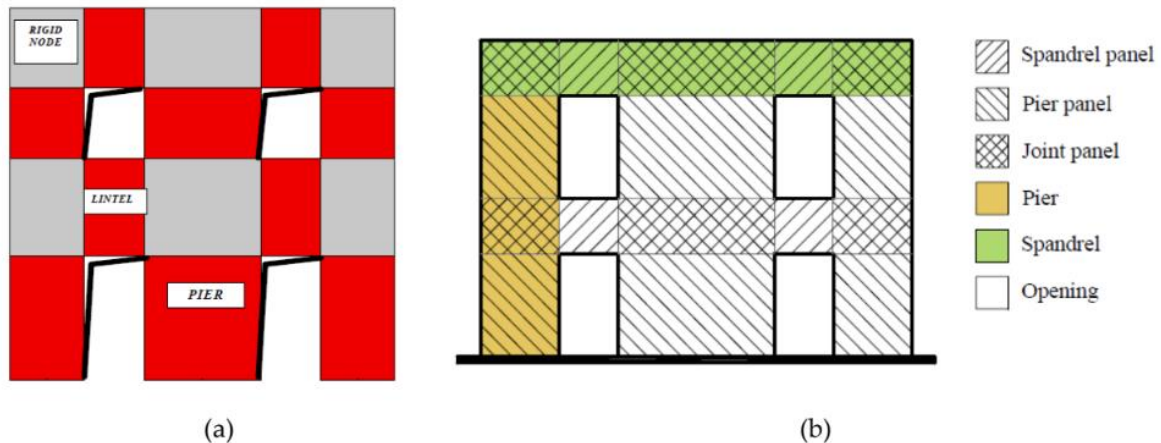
(a) Example of macro-element modelling of masonry walls (Galasco et al., 2007); (b) Identification of the macro-element in a characteristic masonry wall with openings (Augenti and Parisi, 2010).
